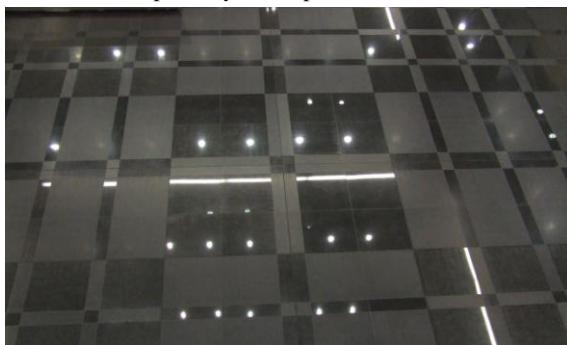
The NLL floor tile cover in the hall on the 1st floor [Source: photo by author private archive, 2014]
